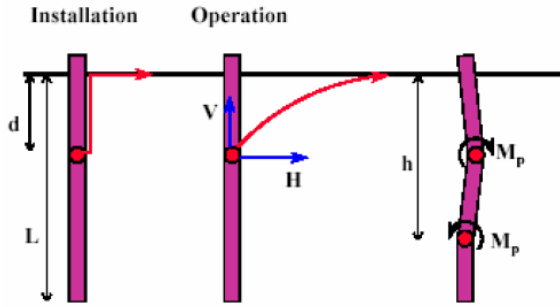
Buckling of anchor piles under tension loading (Adapted from Sharma 2005)
